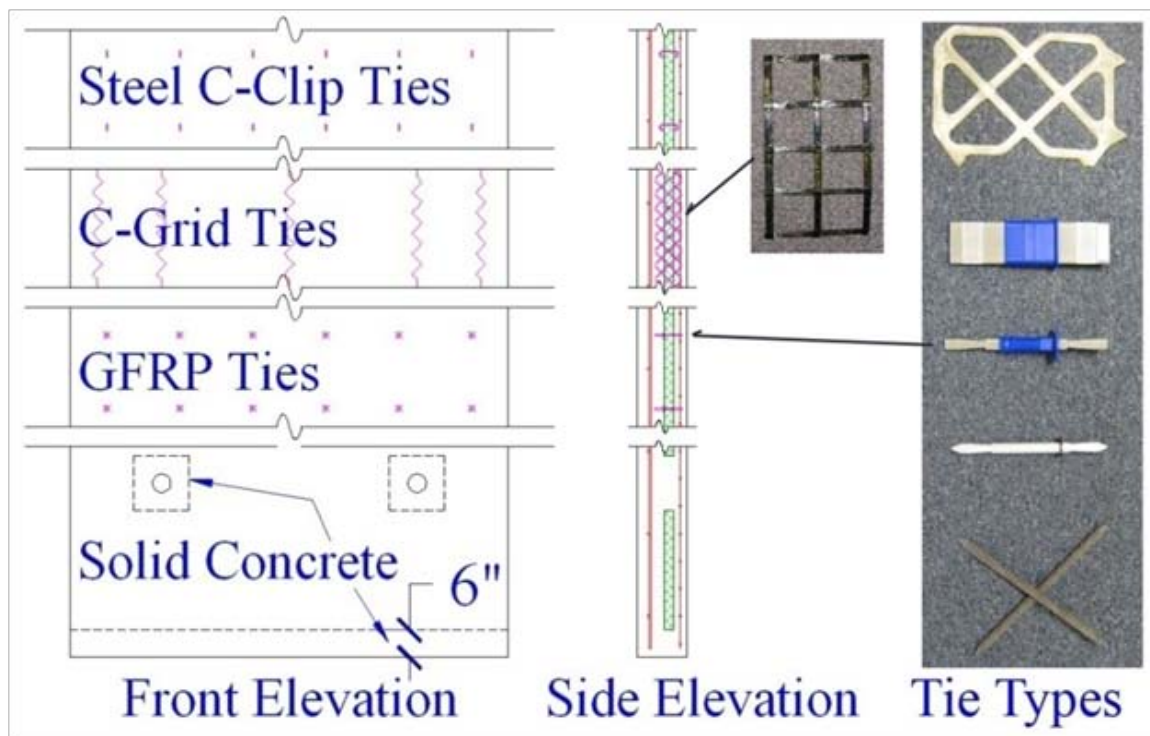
Shear Tie Connections in Sandwich Wall Panel
